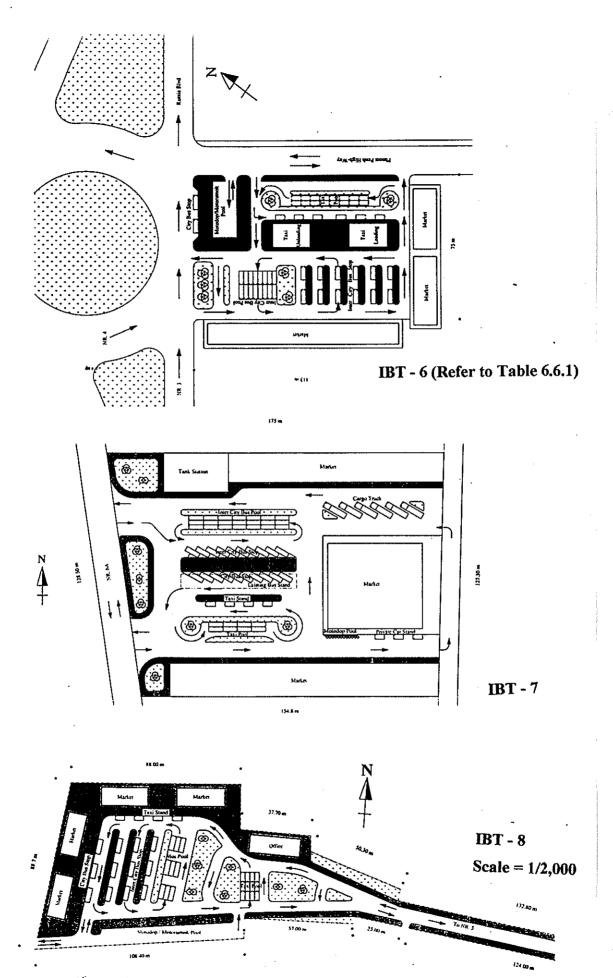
Preliminary Layout Plan of Mode Interchange Area
